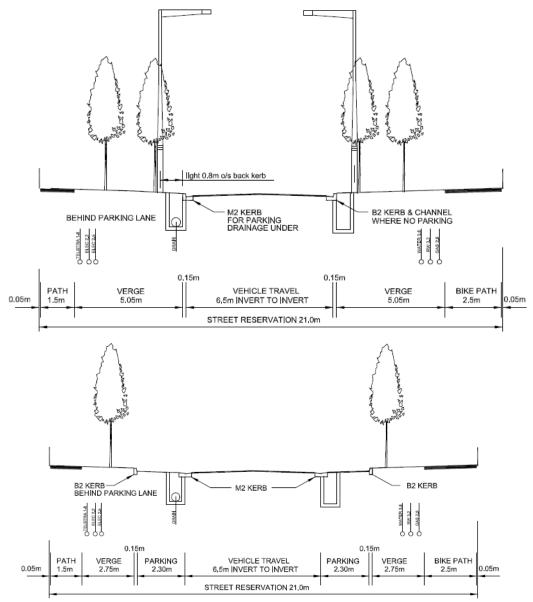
Cross section for Connector Street Level 1 (showing tree outstands within the car parking lane)
